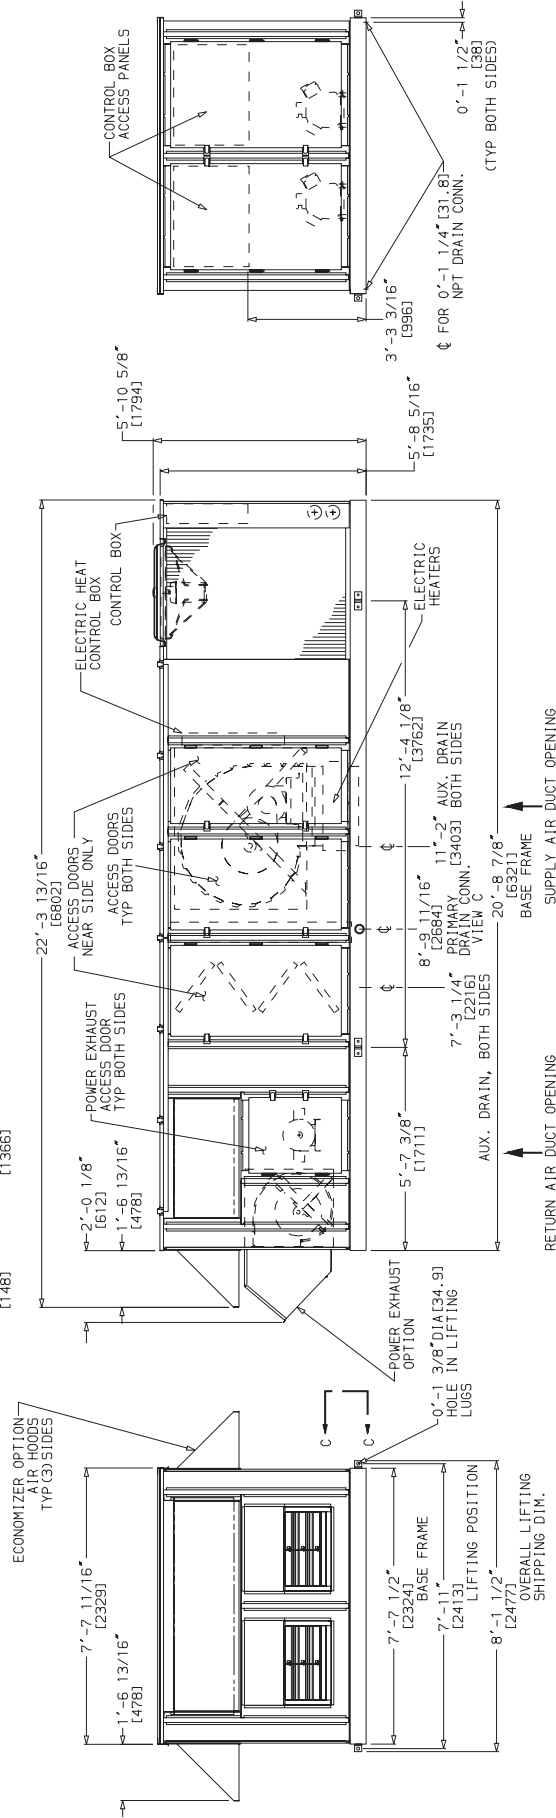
Base Unit Dimensional Drawing — 50ZG,ZN030,035 (Standard Chassis)
